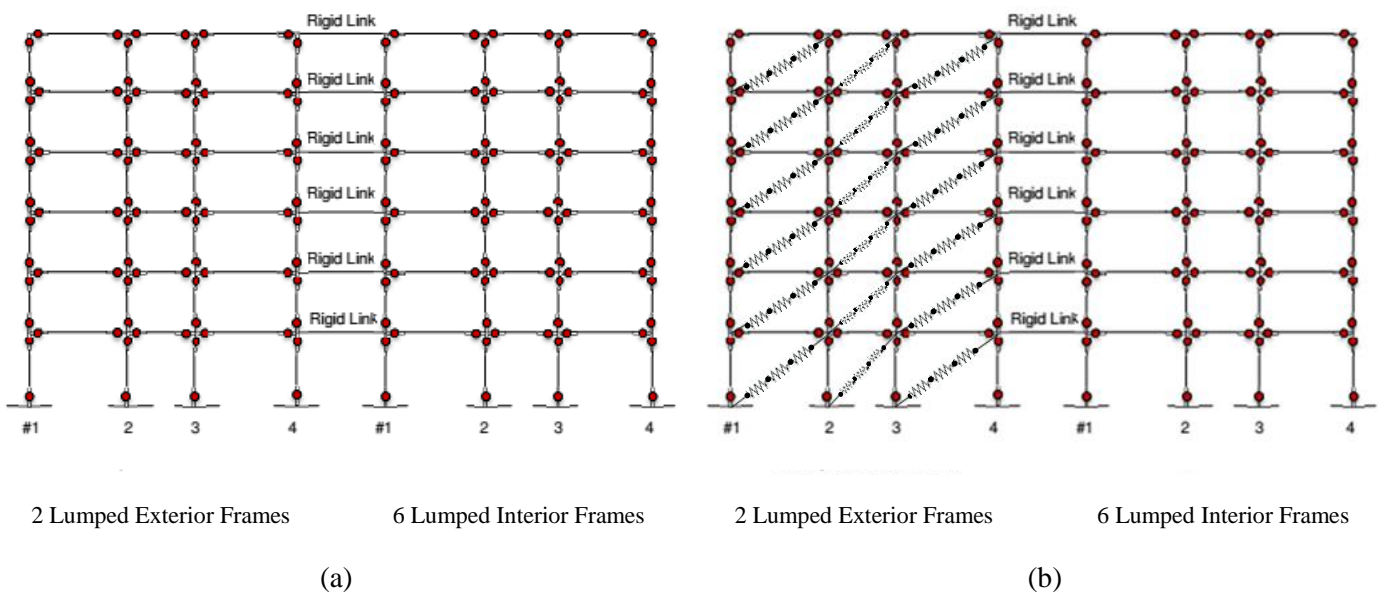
Locations of lumped plastic hinges: a) control building; and b) retrofitted building
